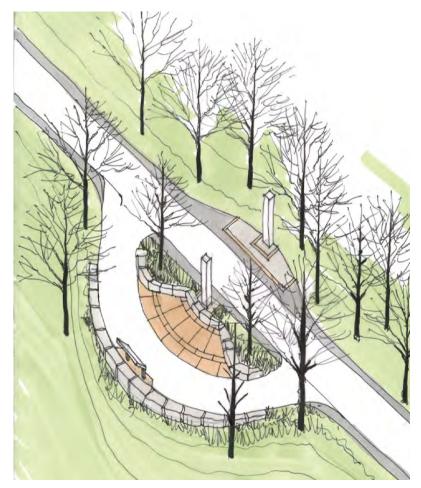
Schematic Plan of Improvements - Spy Pond Overlook
